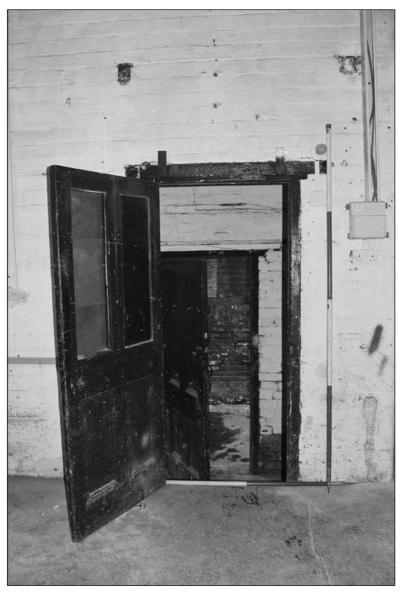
View of inserted doorway within north wall of G21, with G23 and cart passage beyond (film 3.9)
